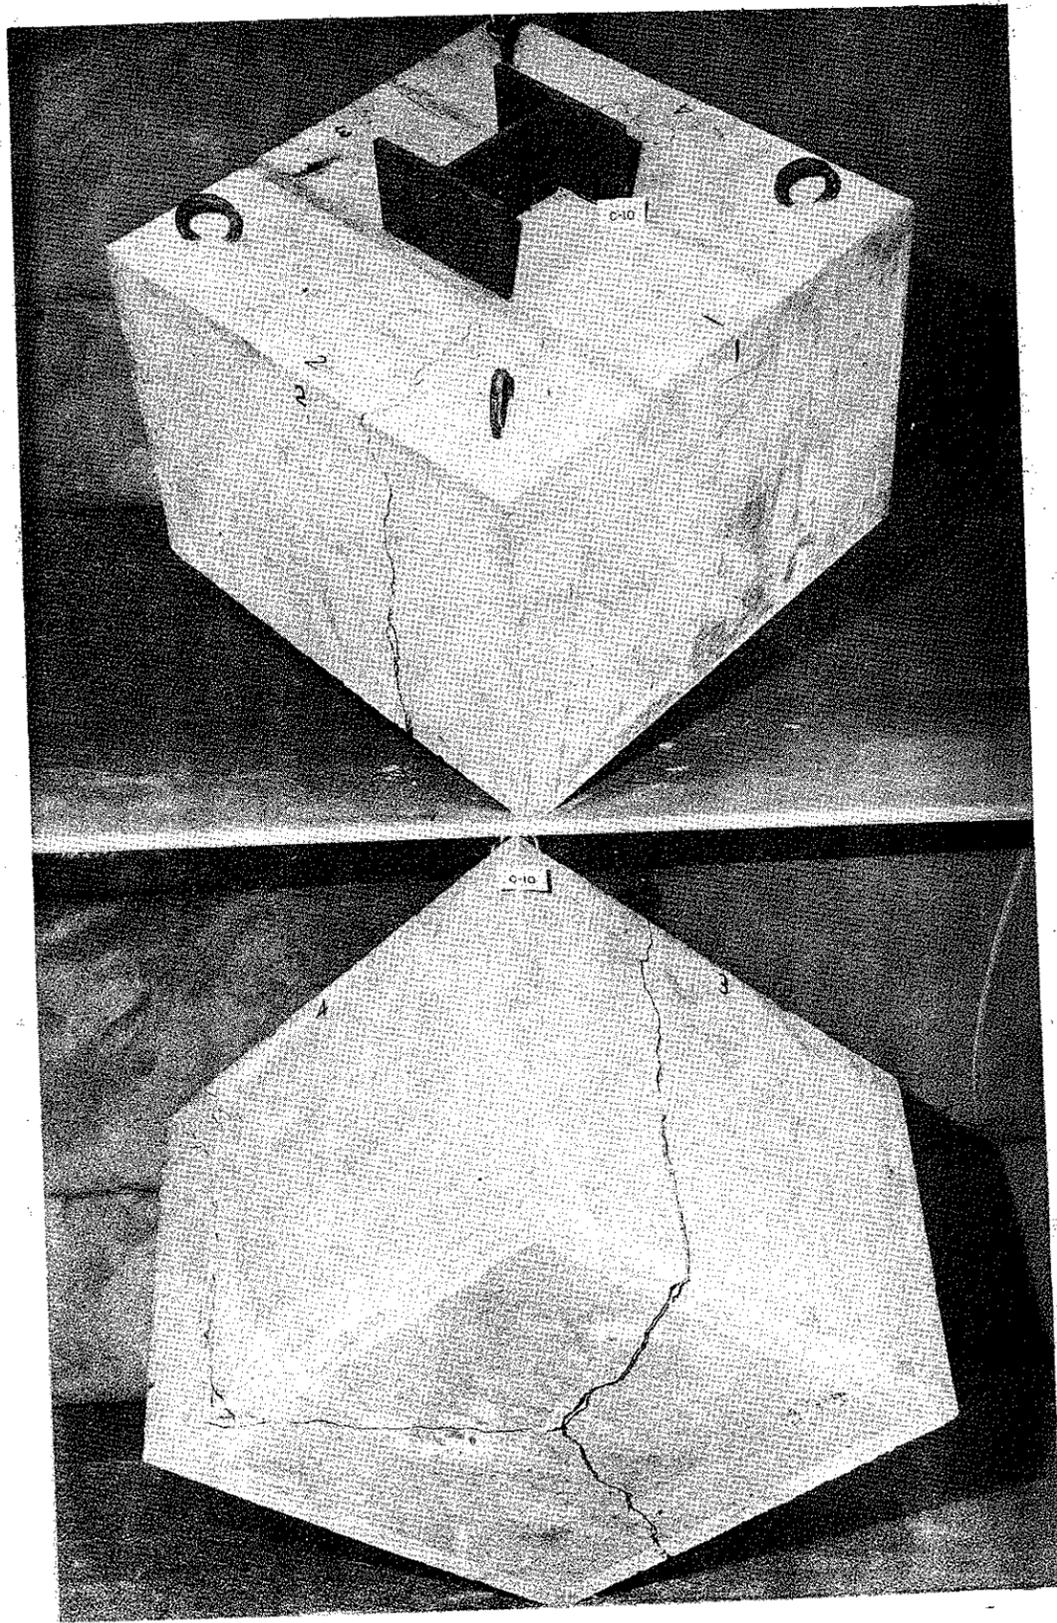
APPEARANCE OF SPECIMEN C-10 AFTER TESTING.
